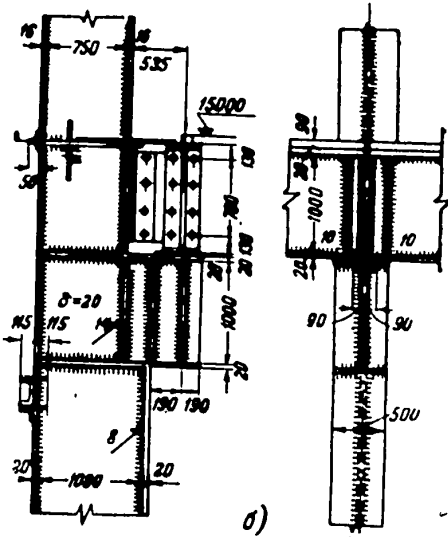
Connection of a crane girder and a frame girder to a column.
